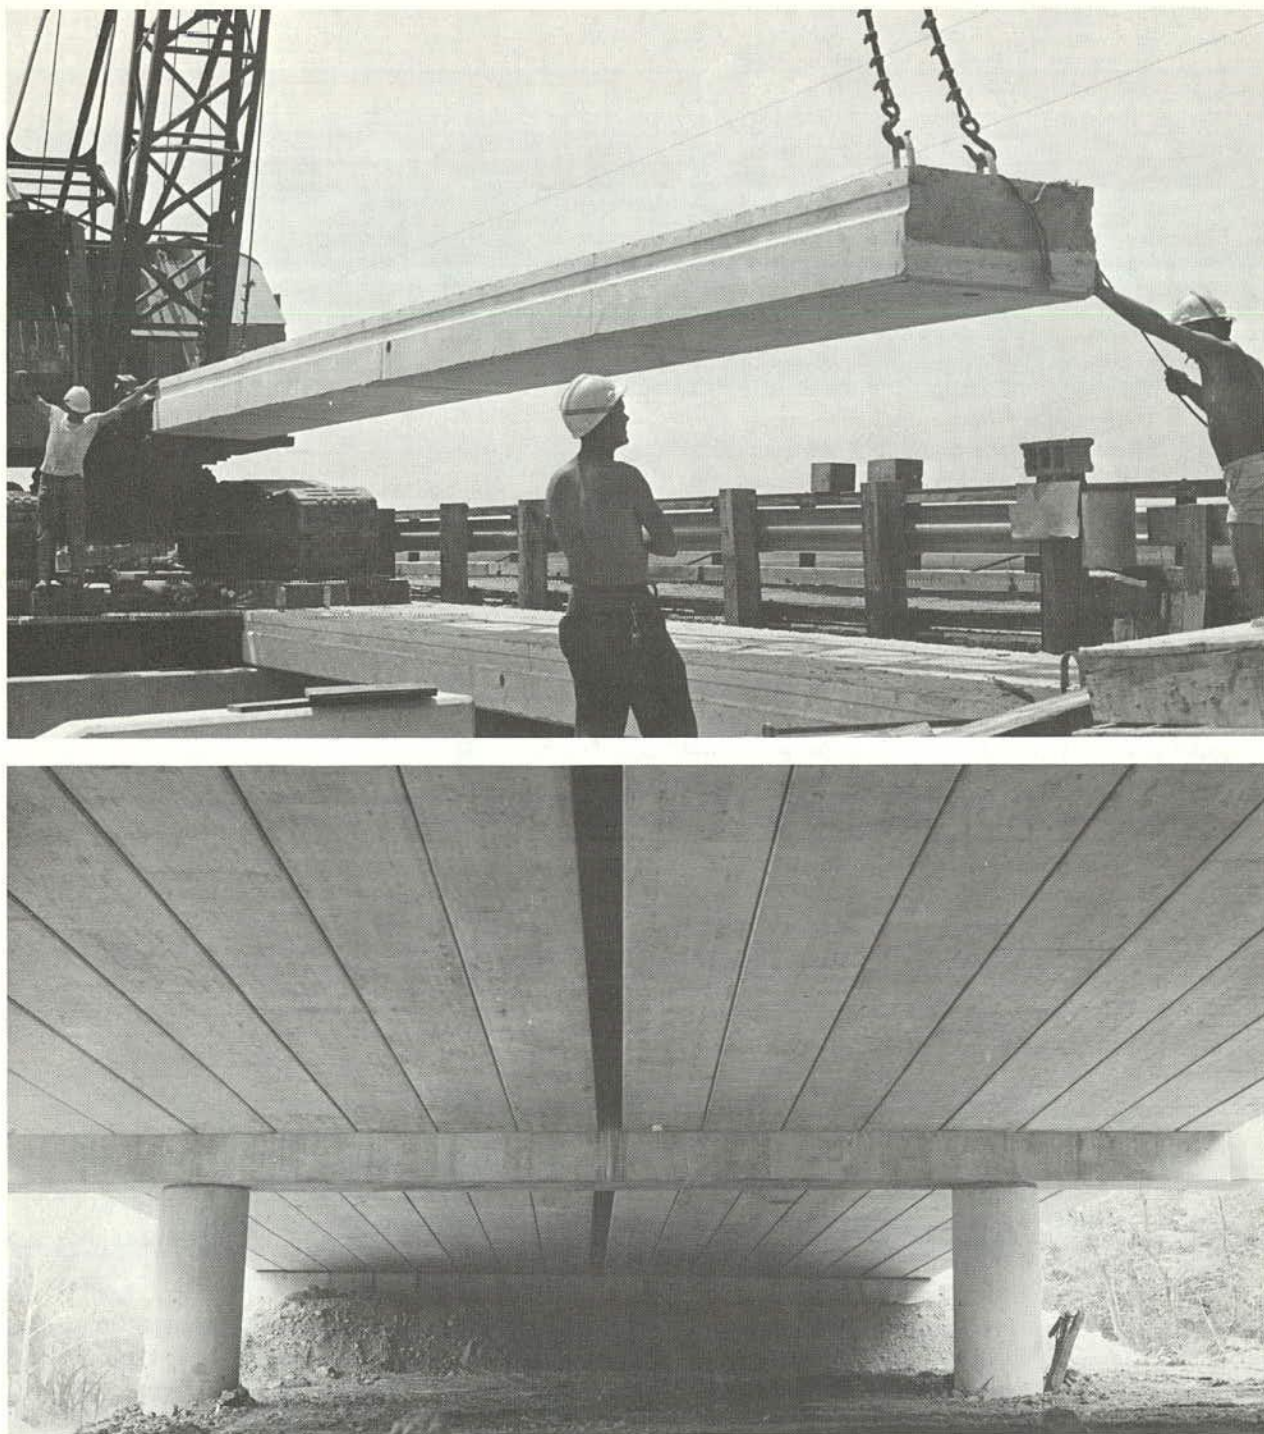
Adjacent box beam bridges. Top photo shows a box being lowered into position on a Delaware bridge. Lower photo is the underside of a bridge in Pennsylvania.
